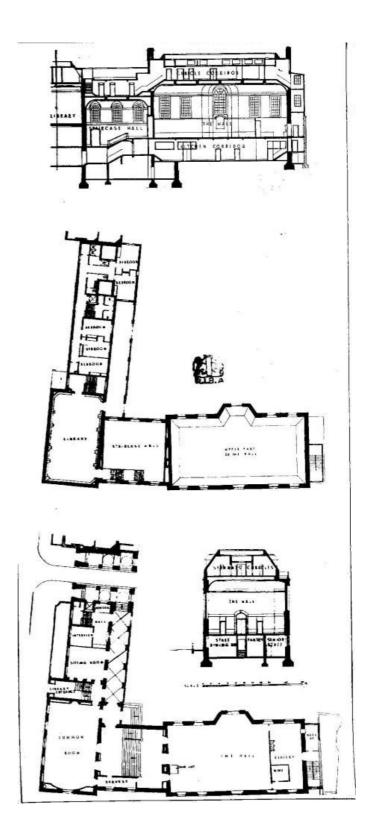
From the top: Long section through hall looking toward the garden; First floor plan and Ground floor plan, and cross section through hall, looking towards Guilford Street [© The Architect & Building News
